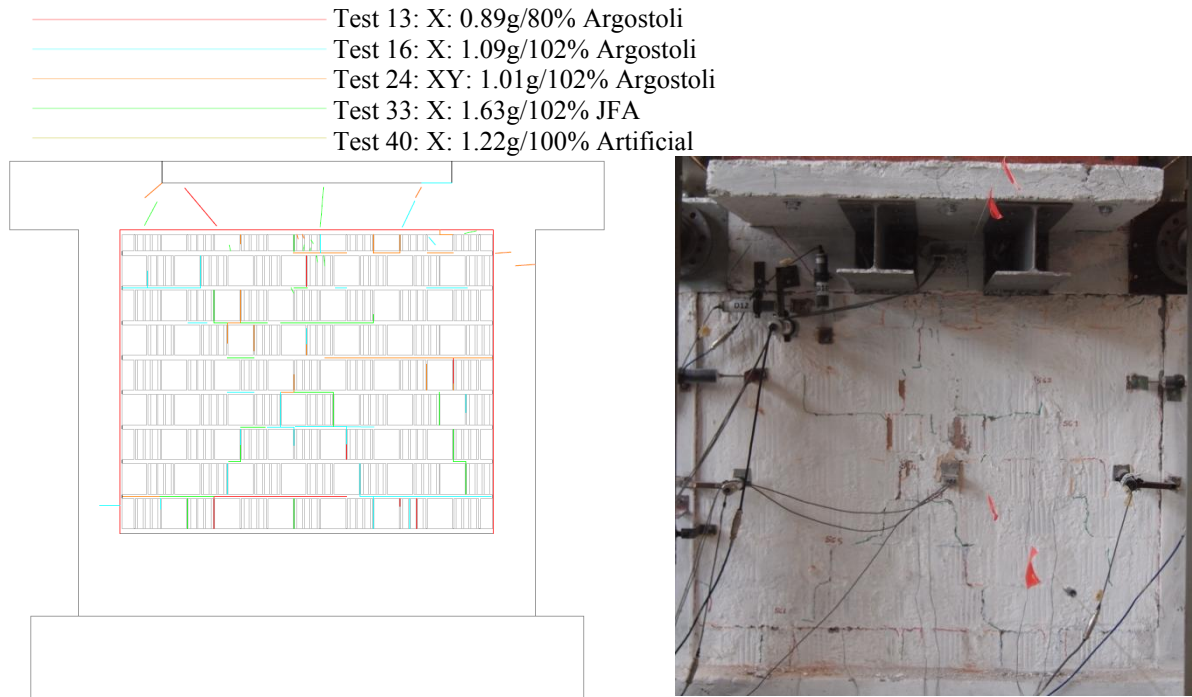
Crack pattern after the second uniaxial test series (Tests 26-40).
